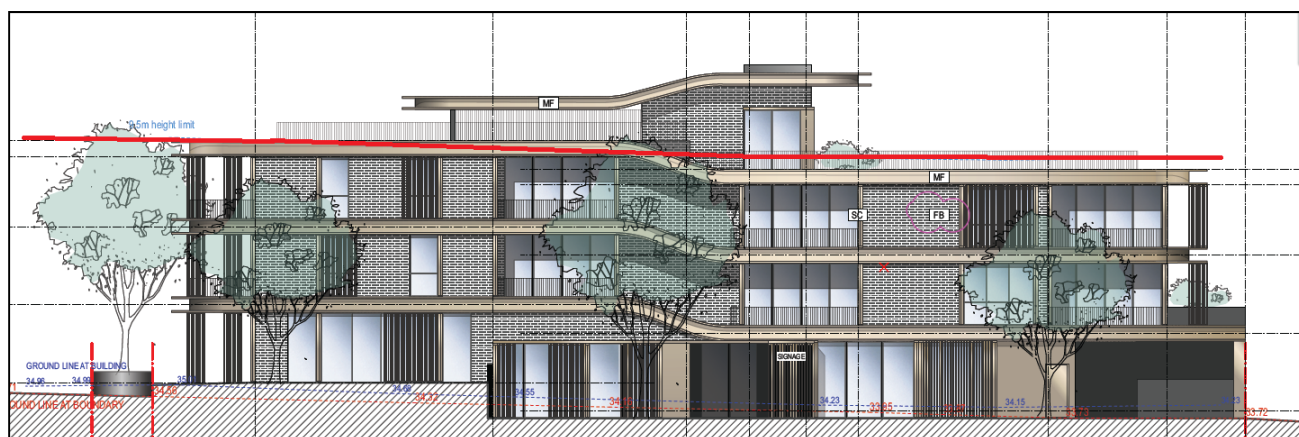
View of the northern elevation noting the extent of the proposed building height variation.
